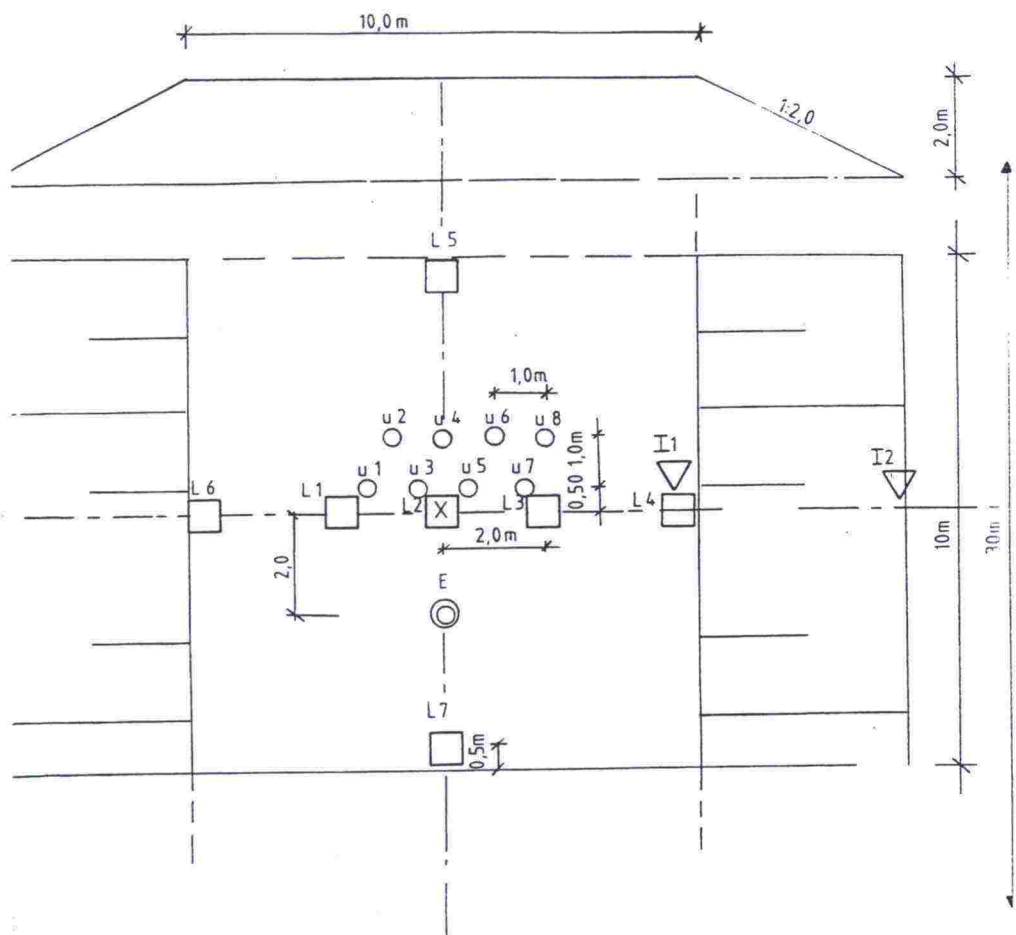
Layout of the instrumentation of Murro test embankment. (Selkämaa 1994)
